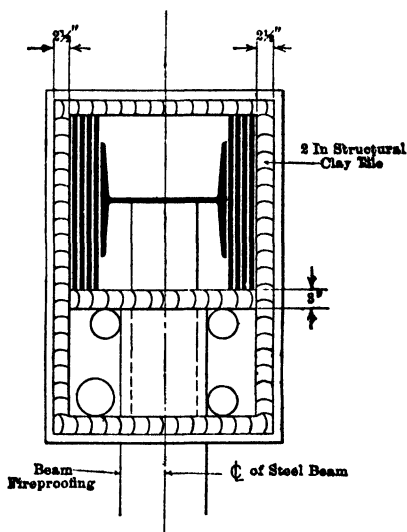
Typical Pipe-Shaft, Interior Column, 40 Wall Street, New York City
